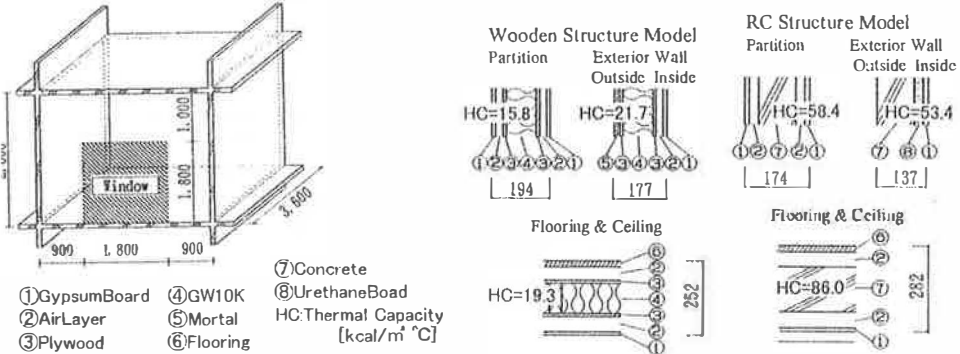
One Room Model of Multiple-Layer Dwelling House and the Wall Structure
